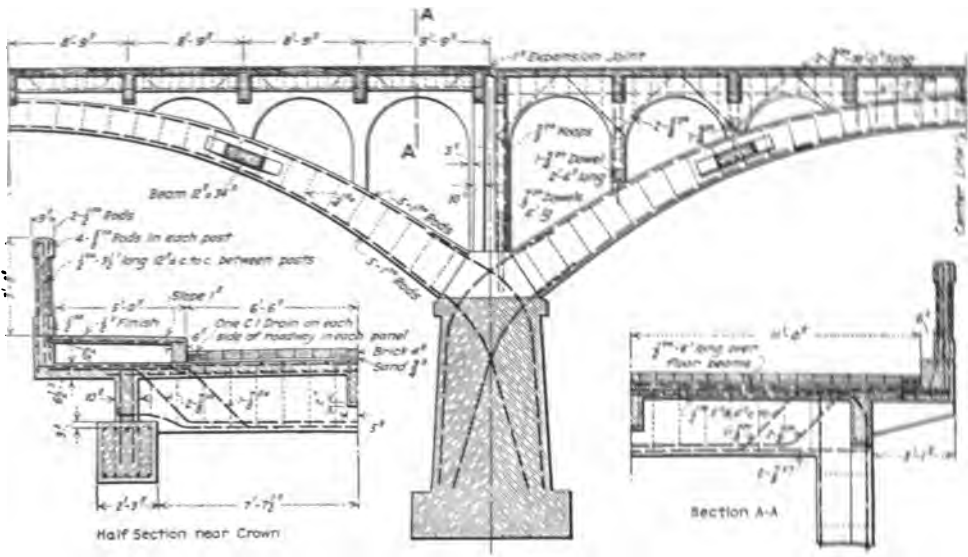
Wisconsin approach to high wagon bridge at Winona, Minn.
